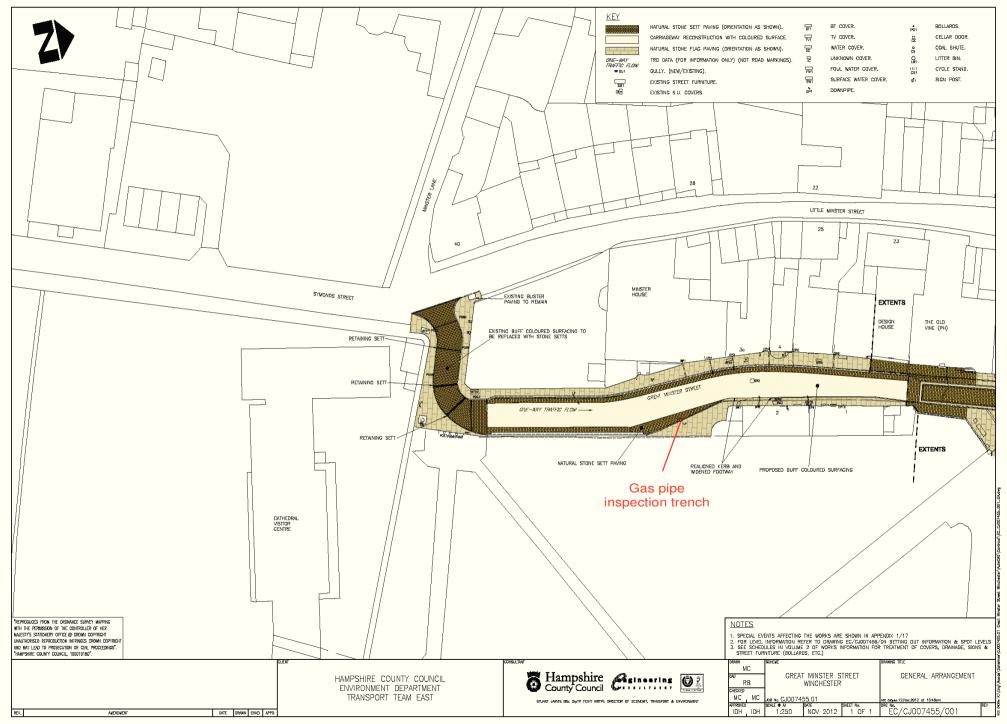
Engineer's plan showing extent of works (HCC Drawing EC/CJ007455/001) (not to scale)
